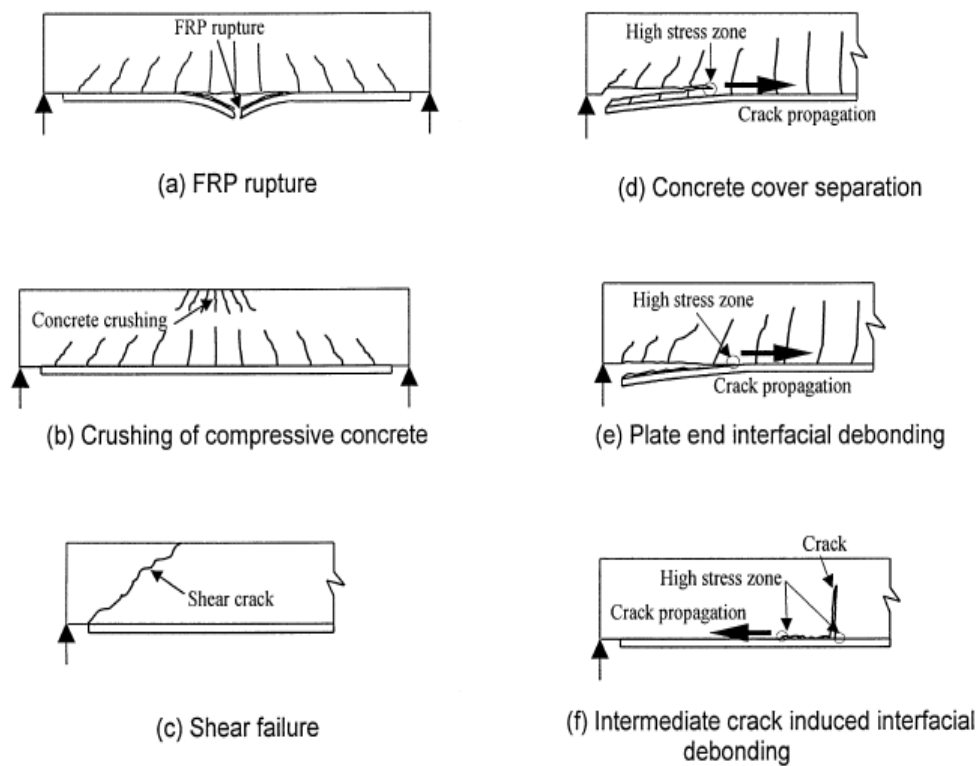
Failure modes of CFRP-Plated beams (Teng J., Chen J., 2007)
